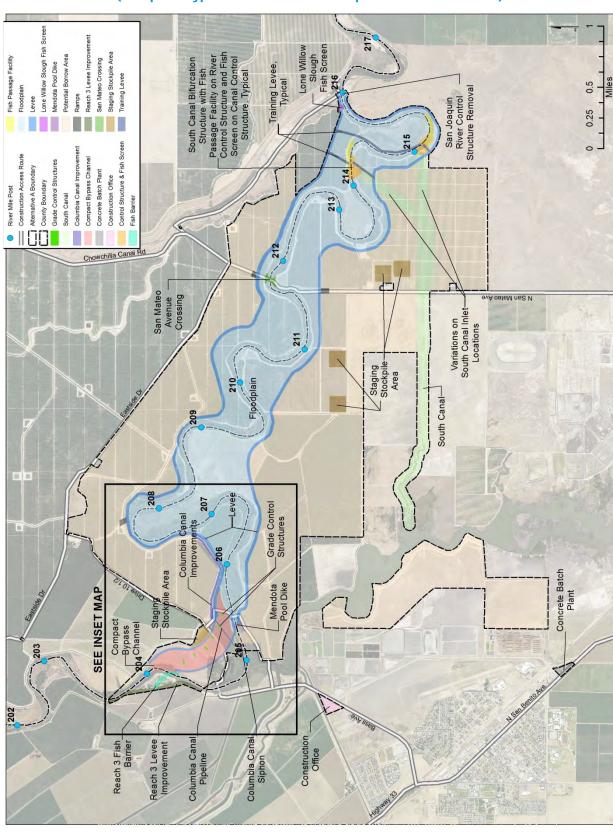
Plan View of Alternative A (Compact Bypass with Narrow Floodplain and South Canal)
